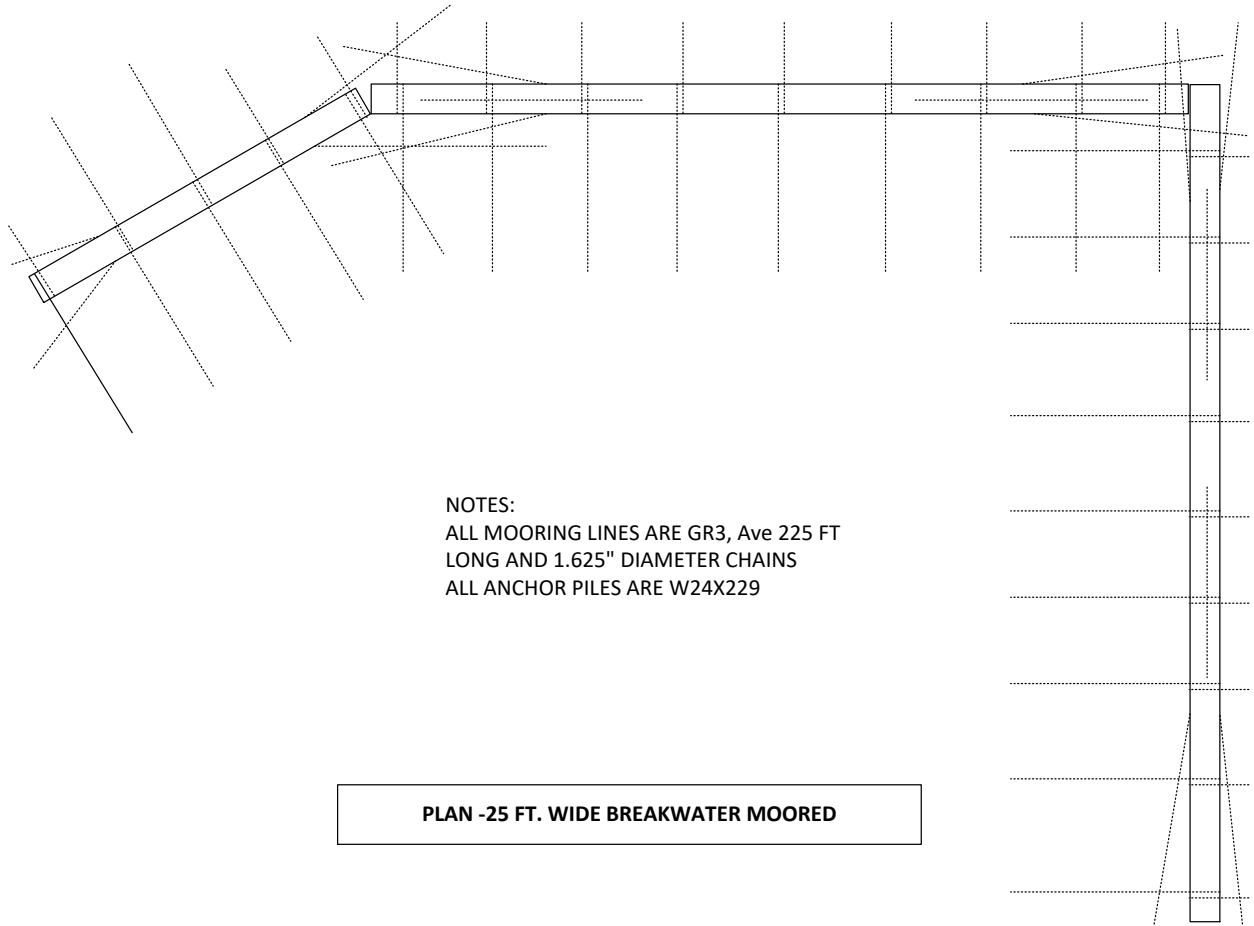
Typical Cable Moored System Installation Plan for 25 and 20' Wide Floats (62 Cables)
